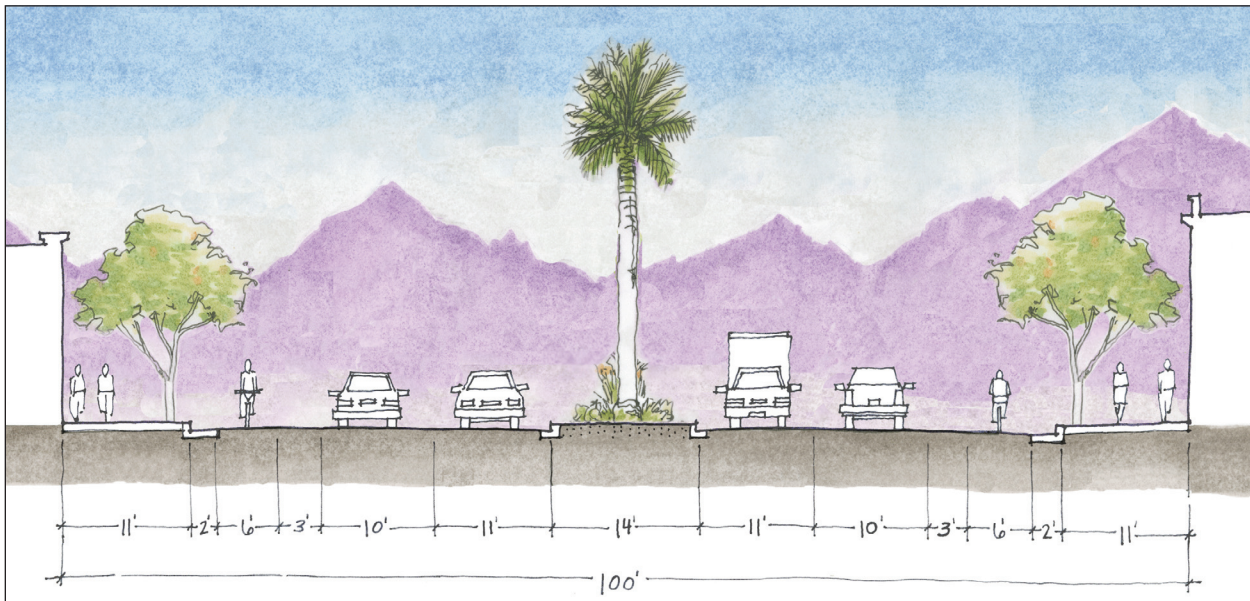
Harrison Street from Avenue 50 to Westerfield Way/1st Street looking north – Proposed Option 2
